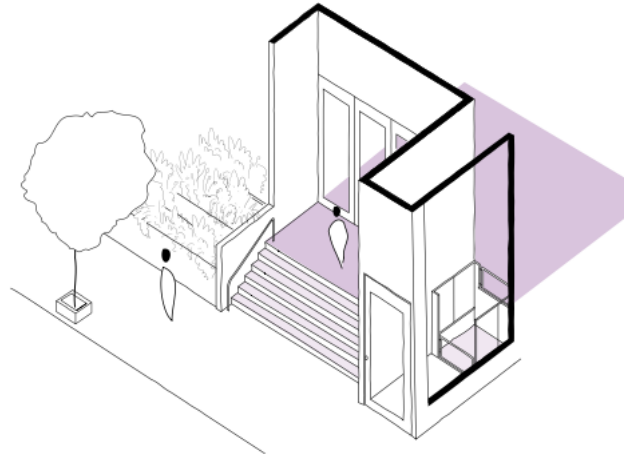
Internal platform lifts should only be provided where no other solution is possible. A platform lift may be located internally using a separate entrance accessible at street level. The platform lift should be fully concealed in the building to ensure it doesn't get damaged.
